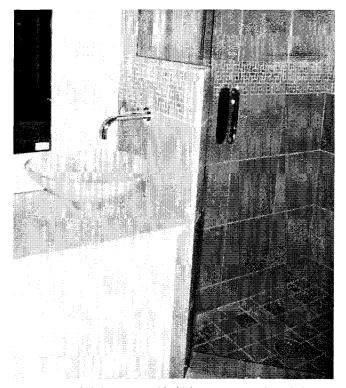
Stone tiled shower set with thick set mortar and sanded grout.
